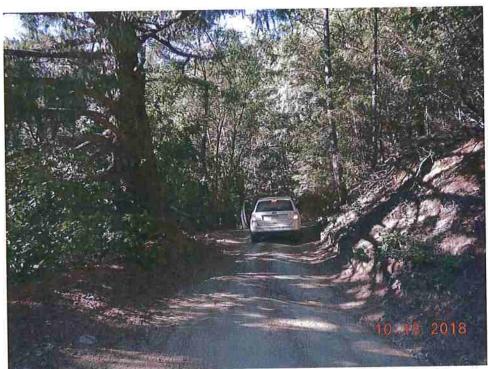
RP9. Pinch point and sight distance restriction. Turnout provided. Facing south.
